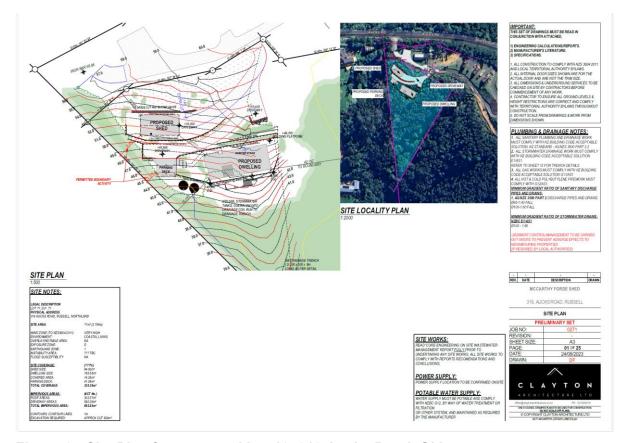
Site Plan for proposed Lot 10, 319 Aucks Road, Okiato.
